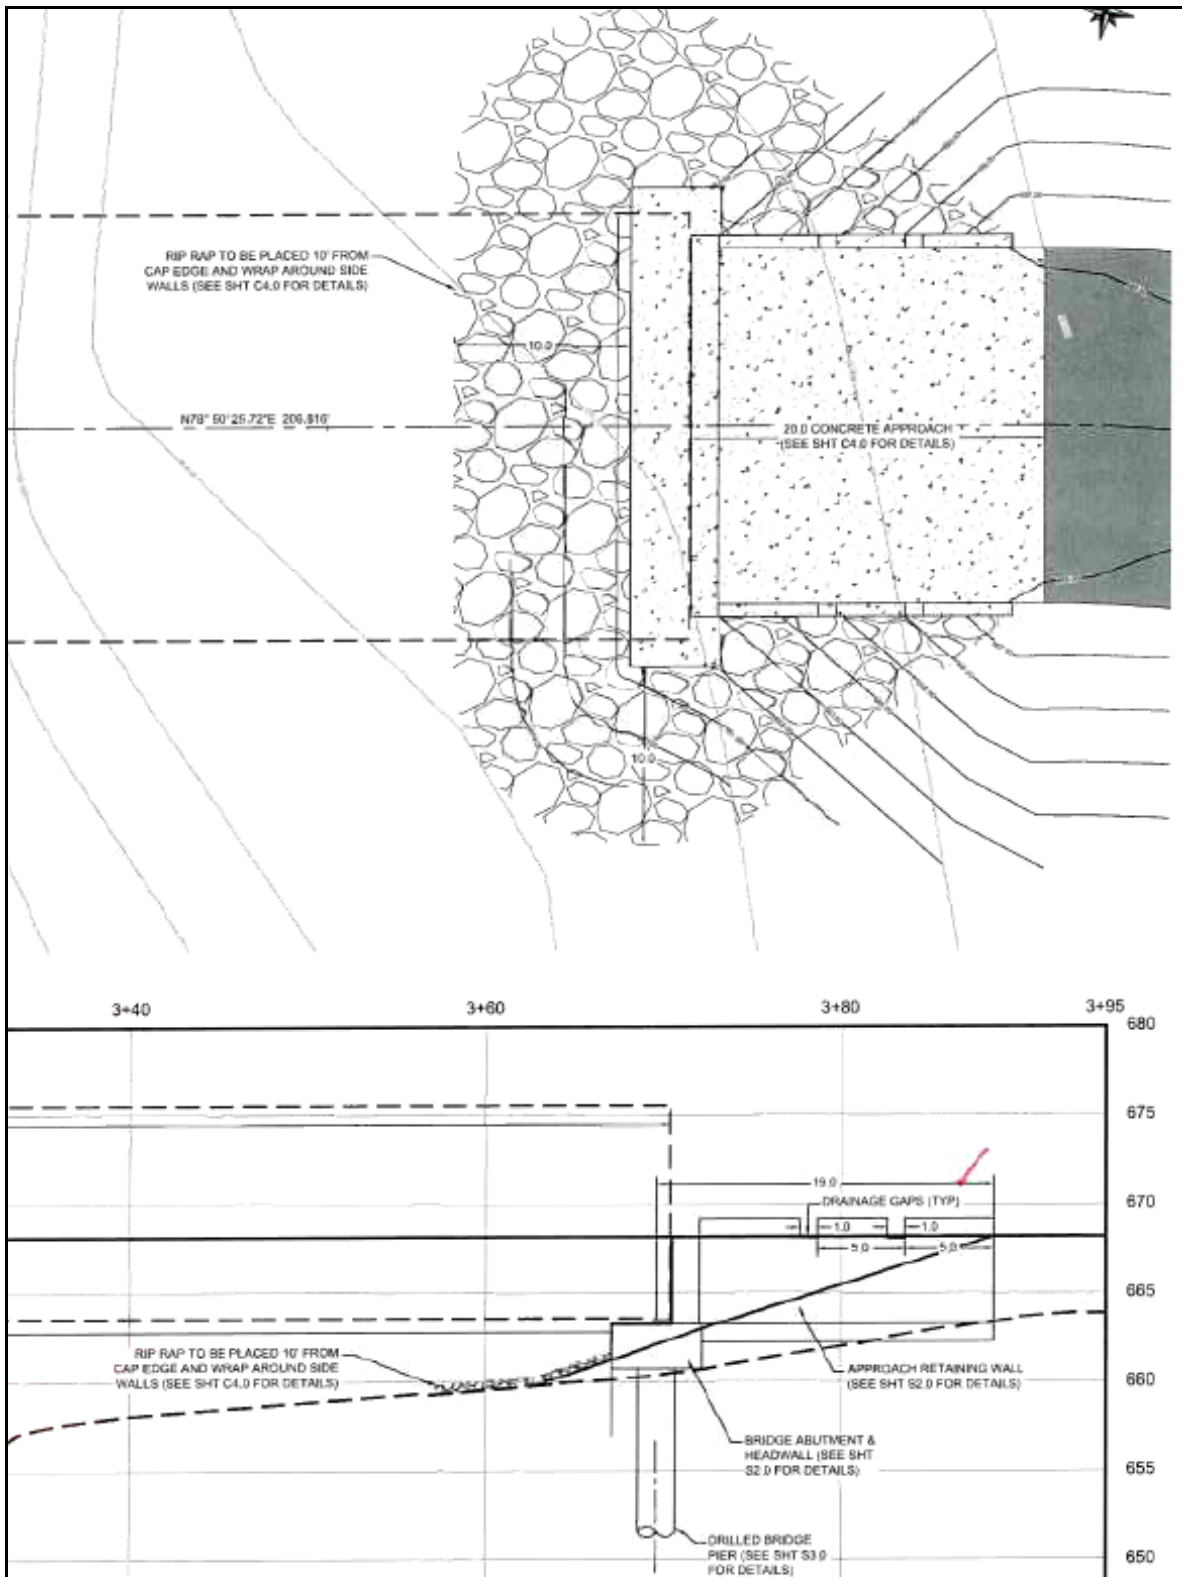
Schematic of the proposed bridge footer on the slope of the creek bank
